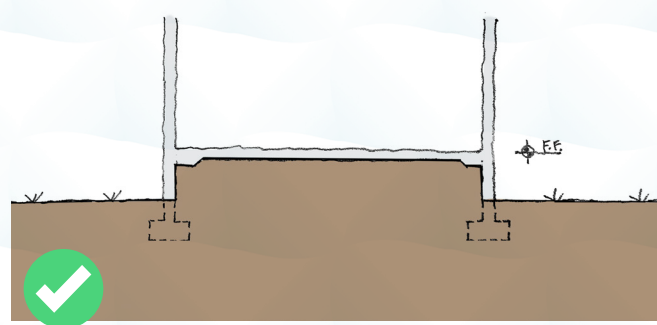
Stem wall footing, or an enlarged monolithic footing, which raises finished floor above ground level without mounding is preferred.
